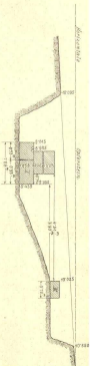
Section through dam III (Güter Hütte); the slope on the right side has a height of 11.00 m and a width of 10.00 m. The dam is situated on a foundation of 0.87 m. The structure includes a concrete core and a masonry facing. The crest is labeled 'Mauerwerk' and the foundation is labeled 'Mauerwerk'.
